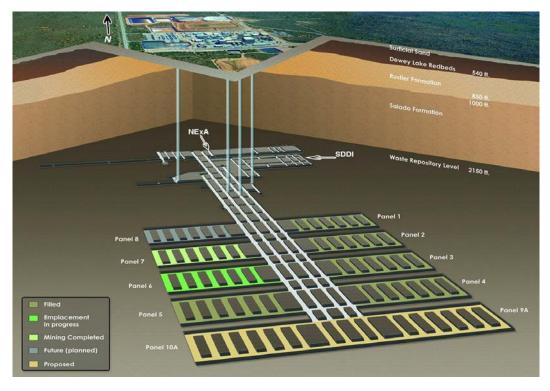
Underground layout of WIPP repository including its proposed expansion to the south
